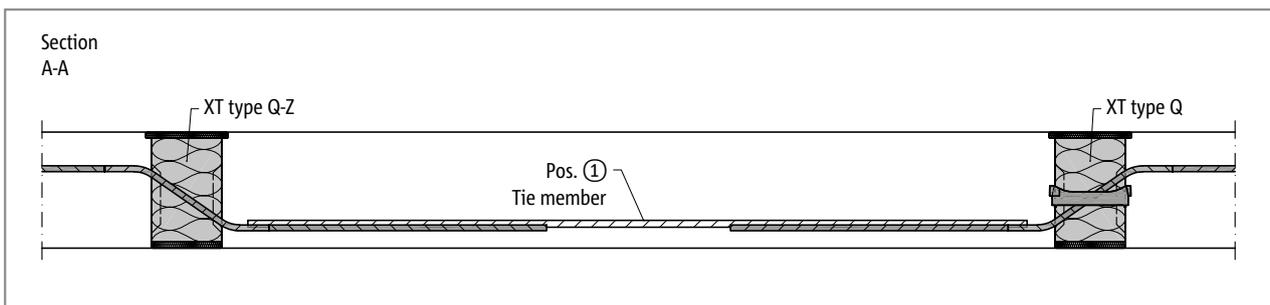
Schöck Isokorb® XT type Q-Z-V5 to Q-Z-V8, Q-V5 to Q-V8: Section A-A; one direction spanned reinforced concrete slab
